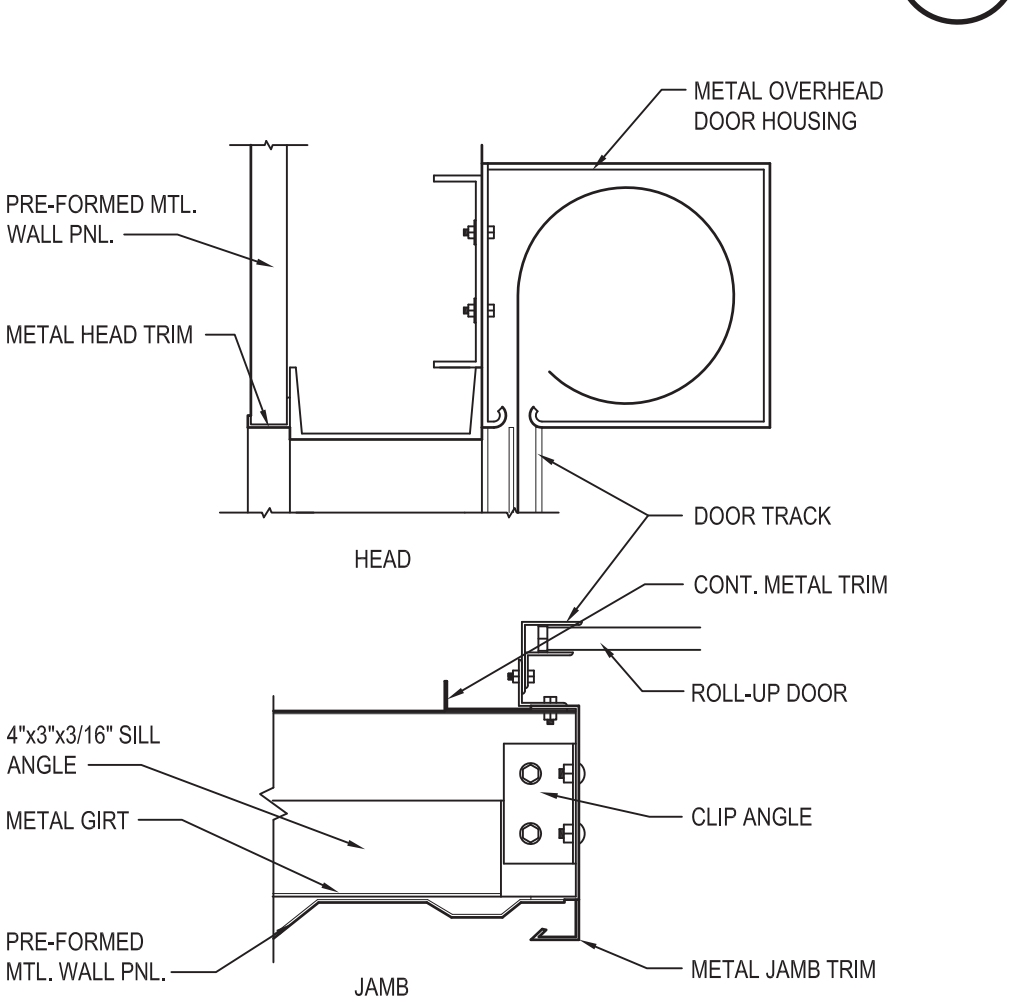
DETAIL - EXTERIOR DOOR JAMB (HEAD SIM.)
